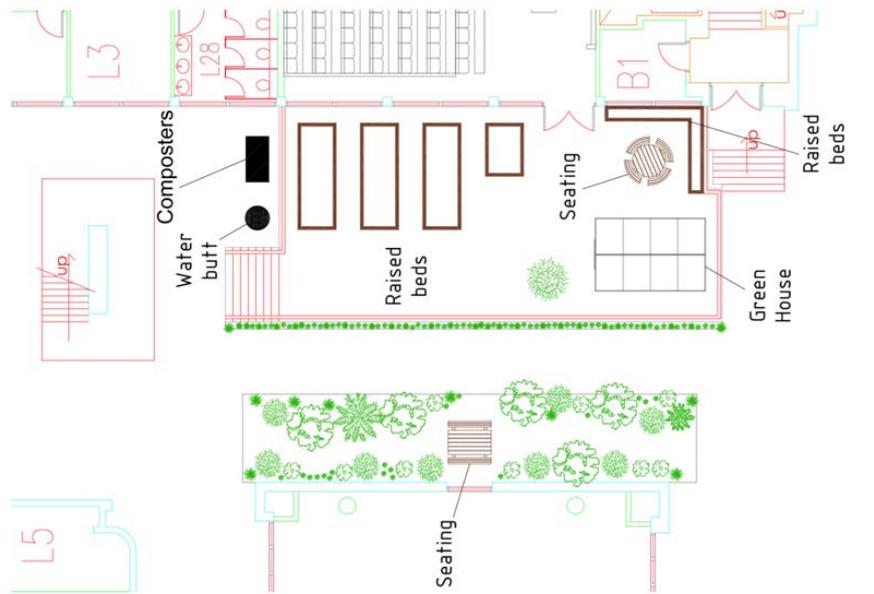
Kitchen garden and rooftop allotment plan (Egan, 2017)
